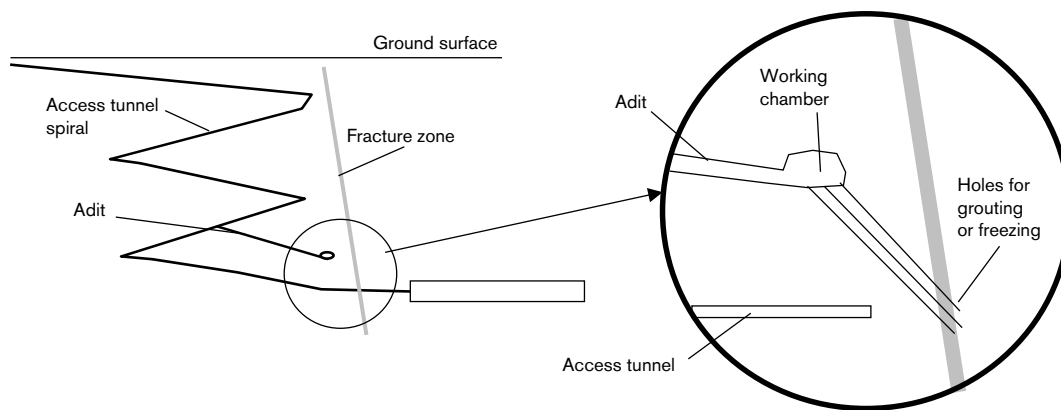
Another alternative for water inflow control at great depths: Pre-grouting or freezing of the water-bearing zone from an adit at higher level.
